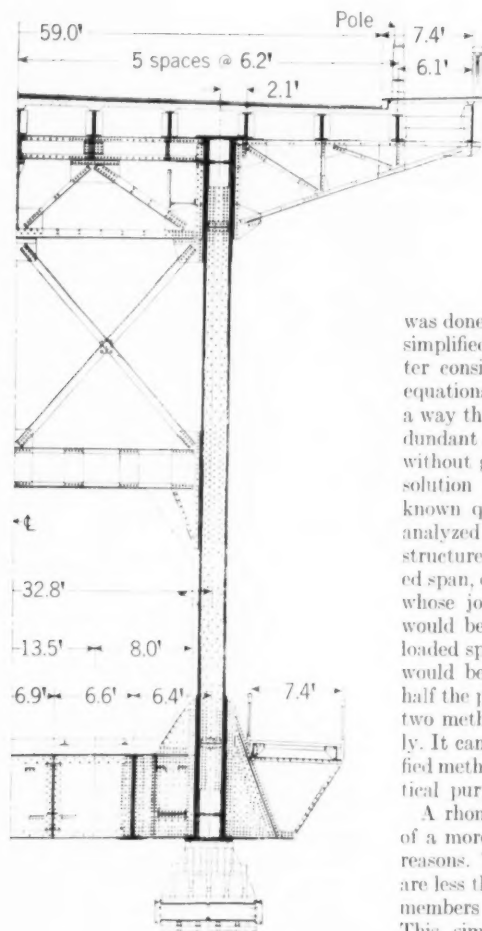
Lower-deck stringers and floor beams were placed at the same level to carry ties and rails directly. Highway deck and sidewalk are made up of prefabricated, reinforced-concrete slabs.
